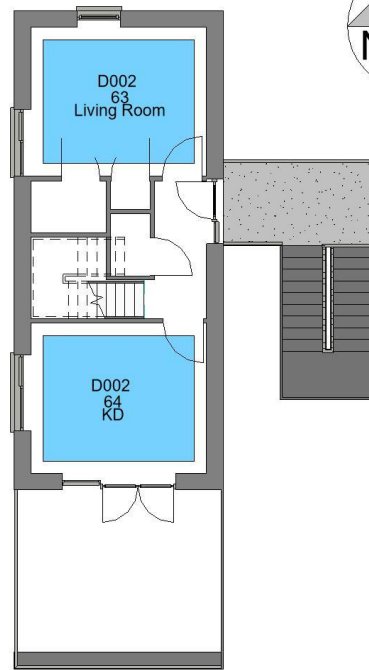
Duplex Units Plans with Daylight Heatmaps
